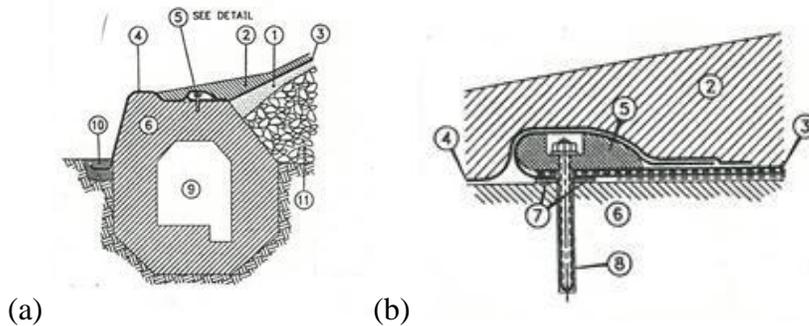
(a) Geomembrane connection to the gallery at Codele Dam showing batter of concrete face and (b) construction detail. Legend: (1) supporting layer (bituminous concrete), (2) concrete cover, (3) geomembrane liner, (4) geomembrane cutoff, (5) HDPE batten strip, (6) concrete, (7) butyl strip, (8) bolt, (9) gallery, (10) clay-filled trench, and (11) rockfill.
